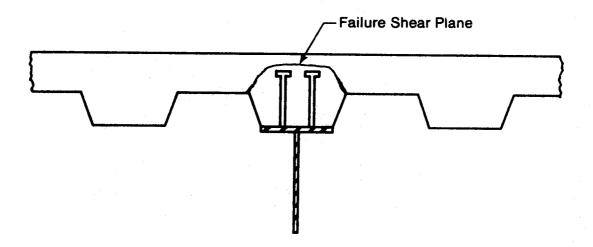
Location of Typical Shear Failure Plane in Slab of Stub
